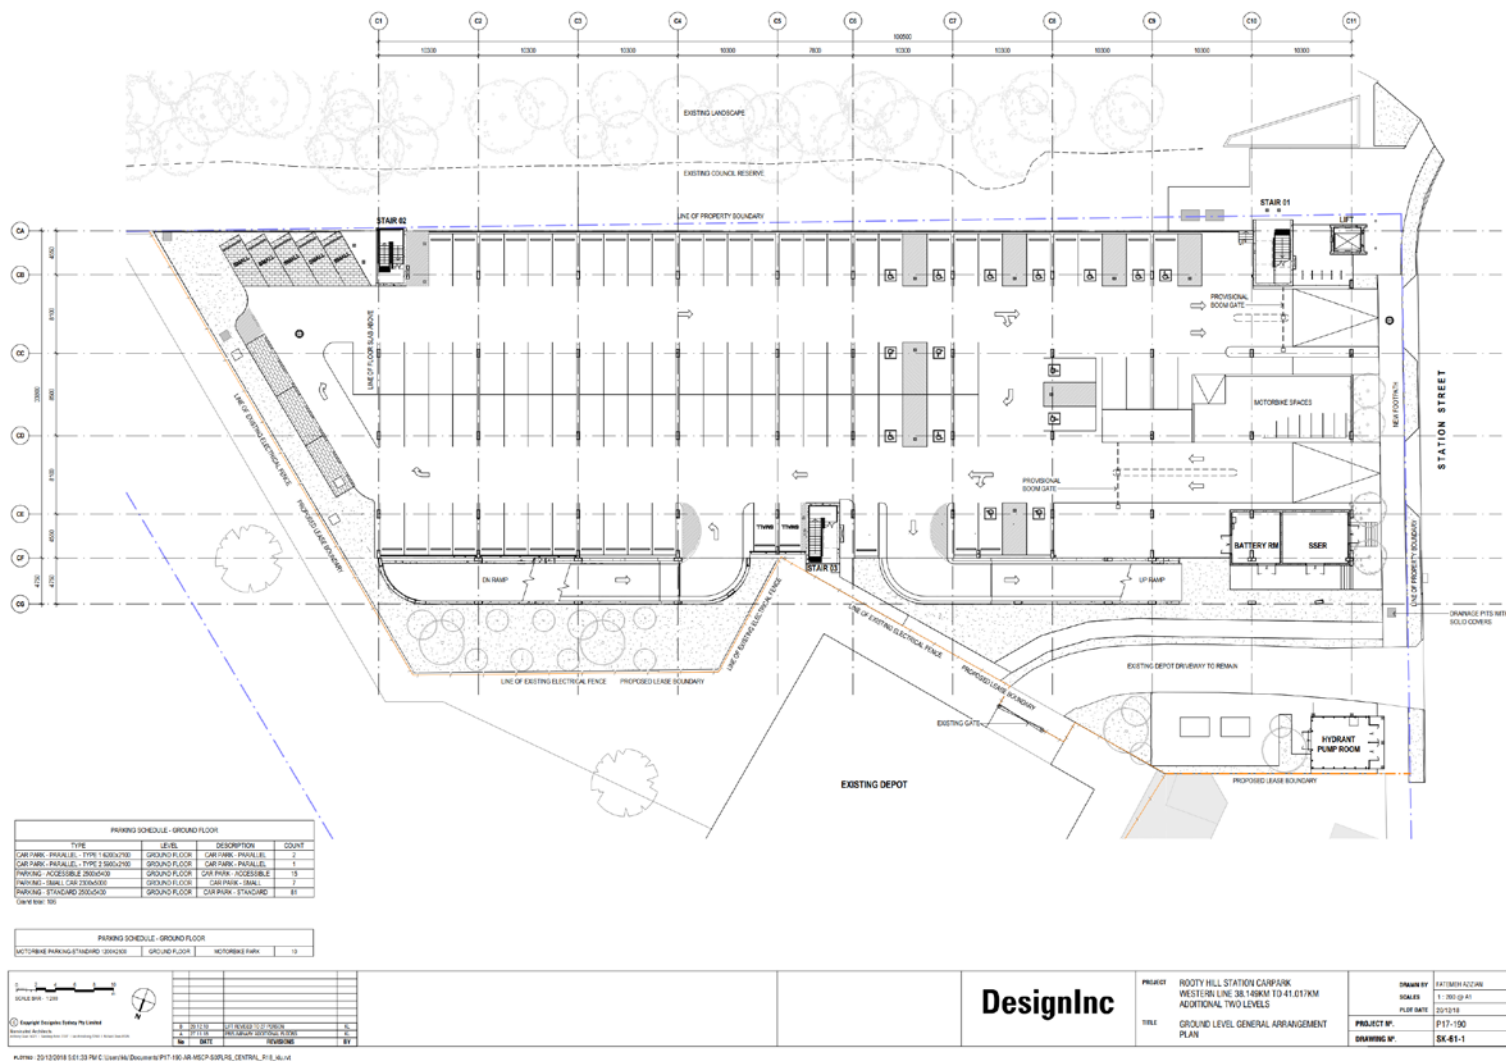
Concept Design - General layout of ground level. Indicative only, subject to detailed design.
